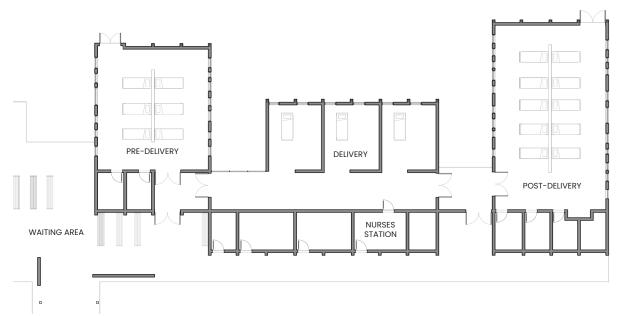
FLOOR PLAN OF RUGERERO MATERNITY WARD
